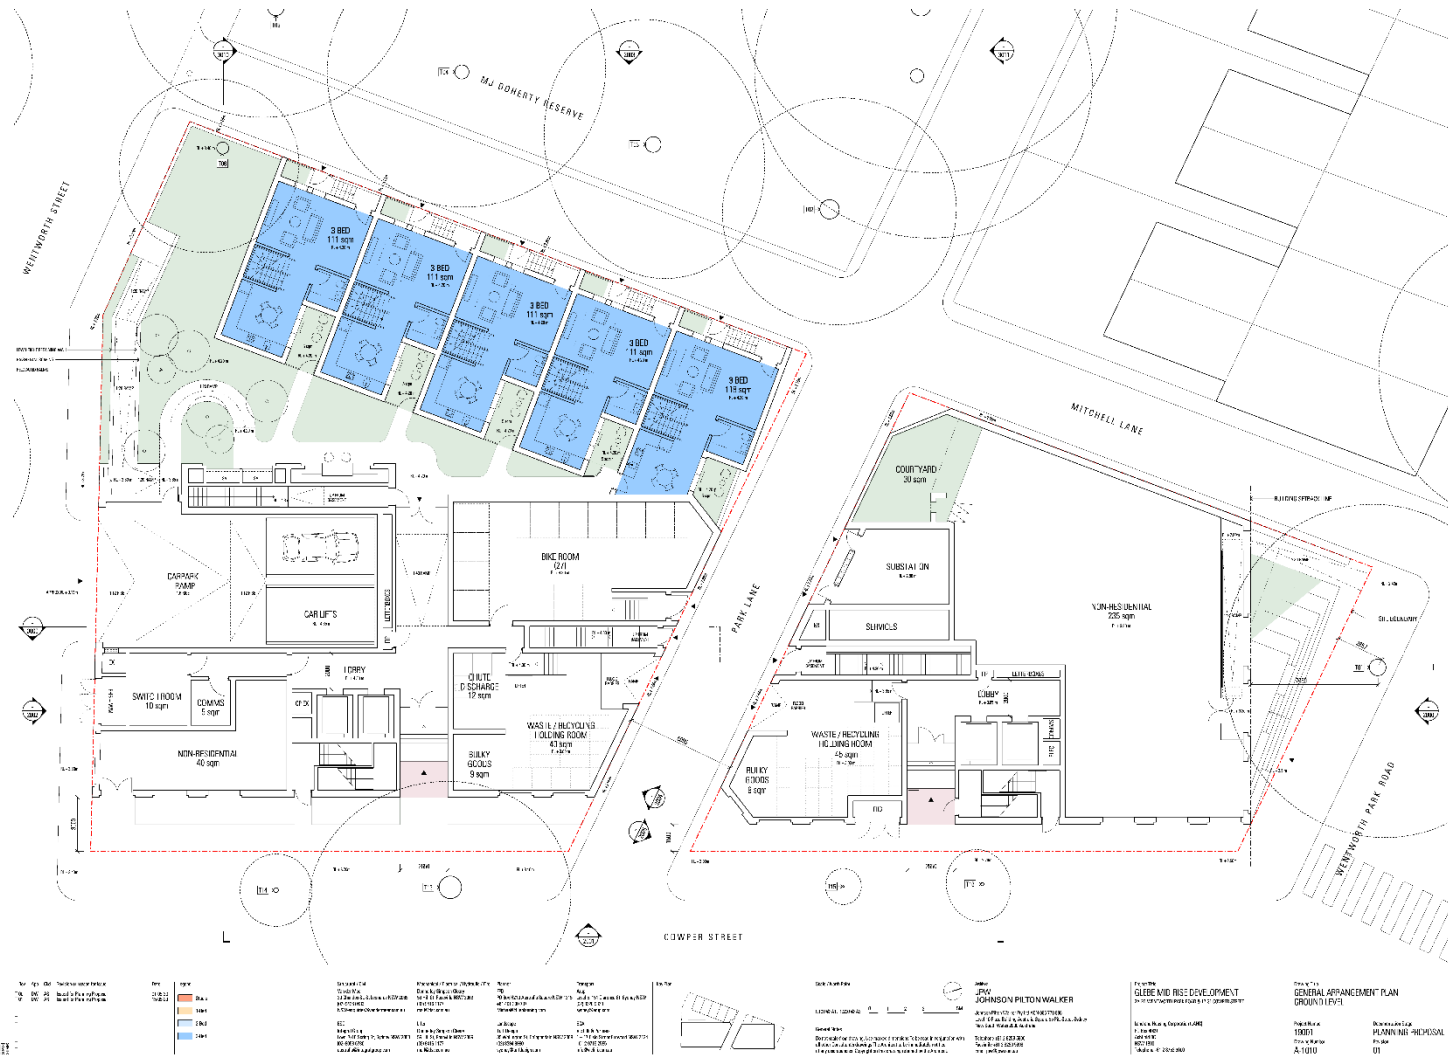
Finalised concept plan of the proposed development, Revision 1 15-05-20, showing the ground floor of the blocks at 17-31 Cowper Street and 2A-2D Wentworth Park Road (Source: Johnson Pilton Walker 2019).
